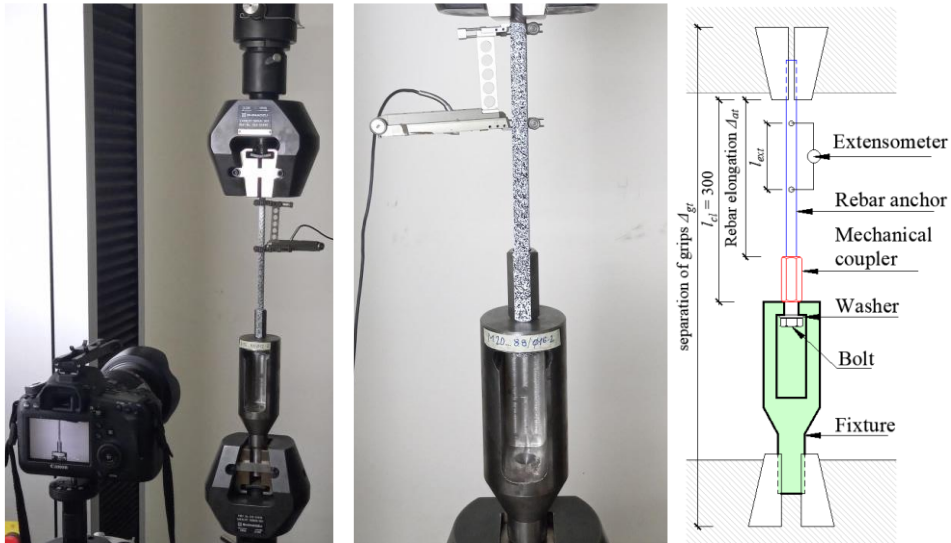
The layout of in-air specimens used for testing bare connectors under tension load
